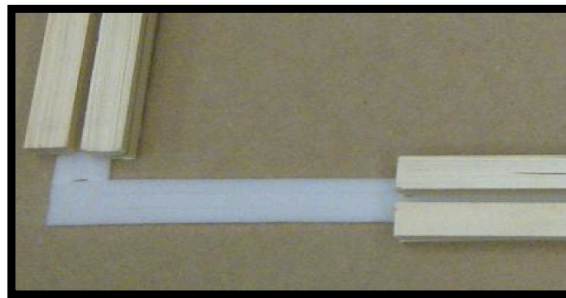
2 WOODEN BEAMS (PANEL ON THE GROUND)
